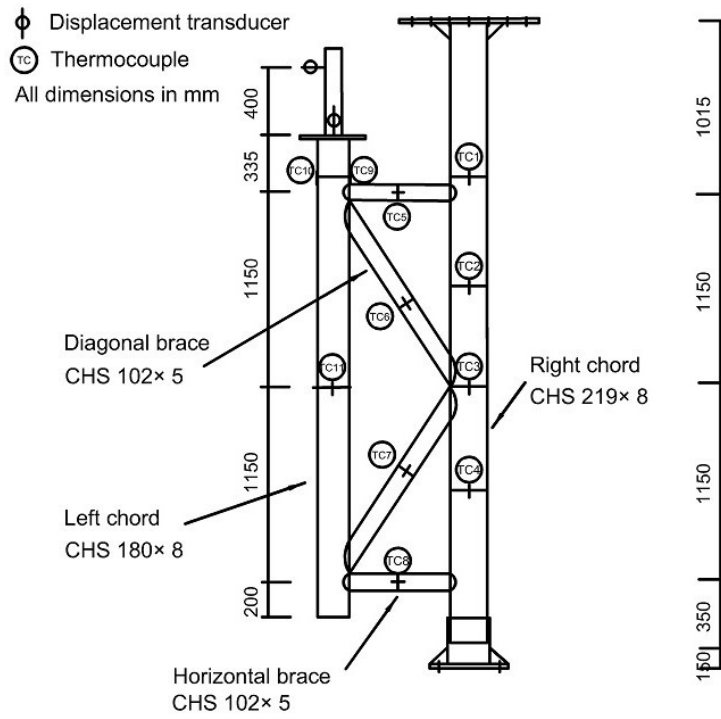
Steel tubular truss test set-up (Liu et al. 2010)
